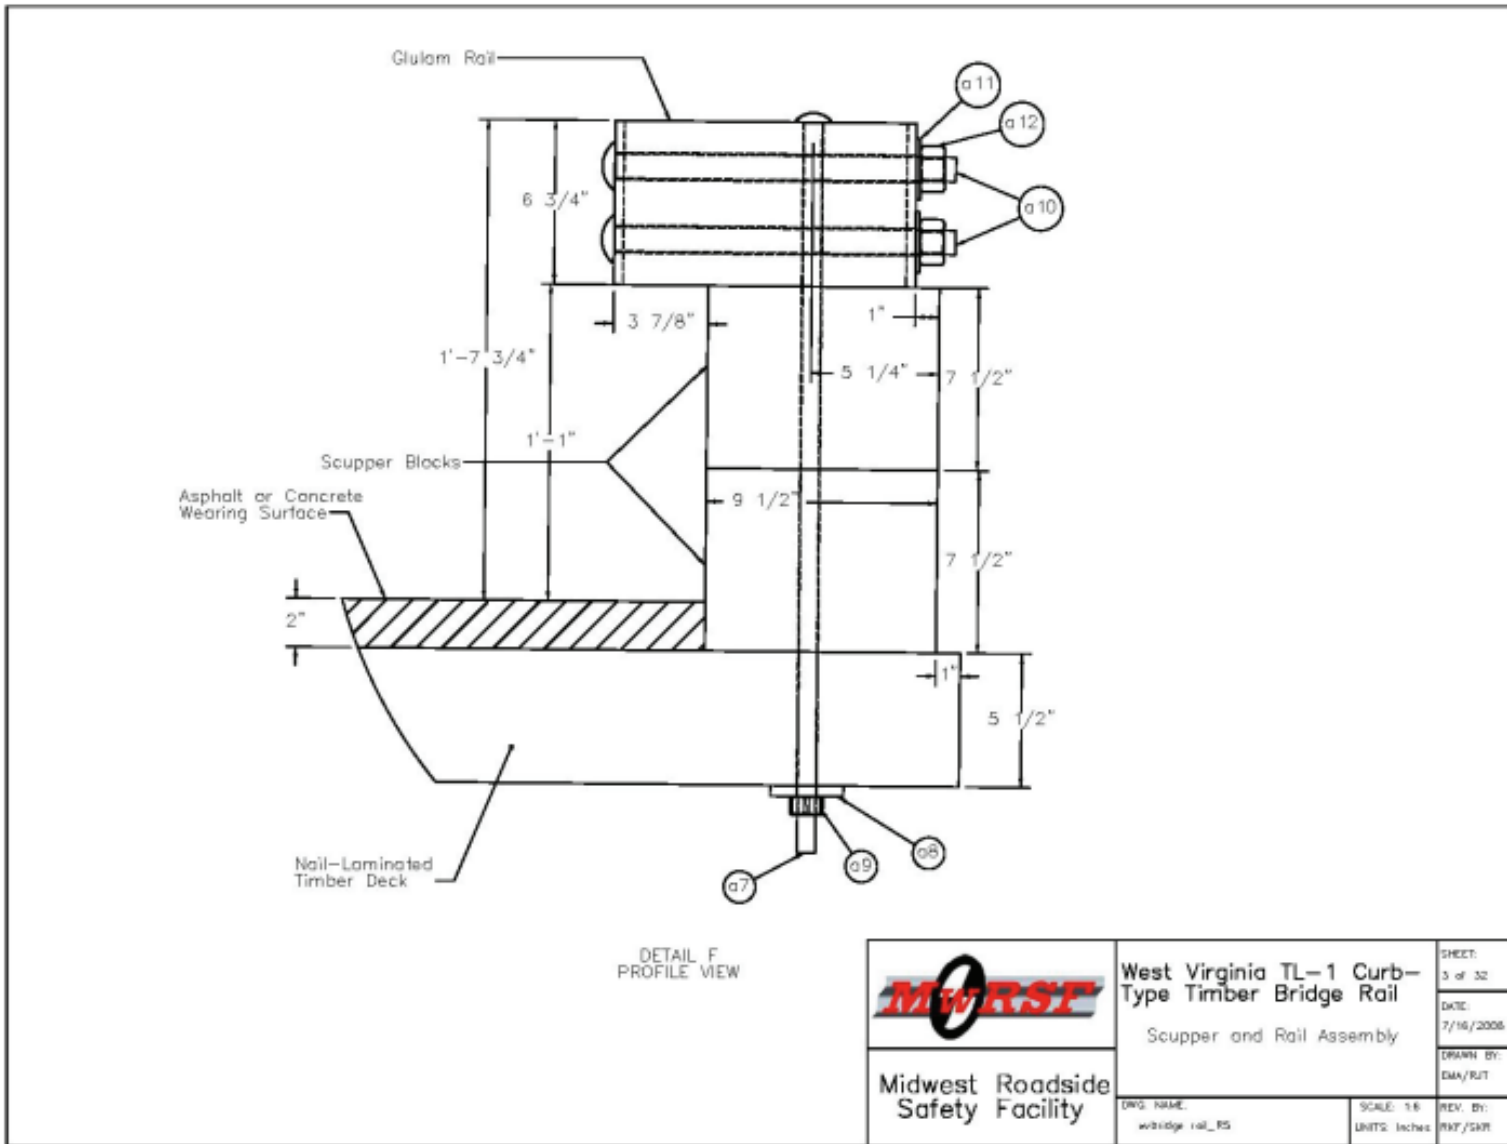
Design Drawing of WVDOT Timber Bridge Rail [11-12]
